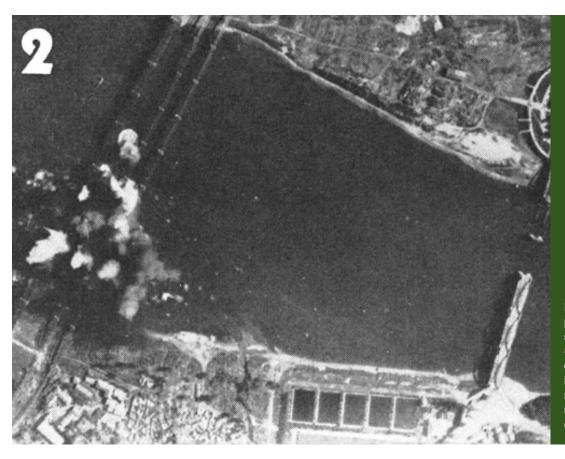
This photo was taken shortly after Photo #1 and shows additional bombs impacting the two single-tracked railroad bridges. (USAF)
